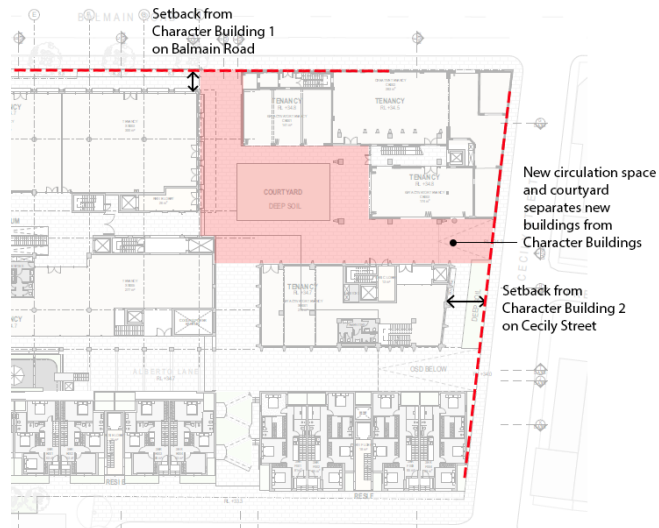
Diagram identifying new zone and setbacks to enable the character buildings to be distinguished from other built elements on the site (Source: NBRS overlay on CHROFI ground floor plan)
